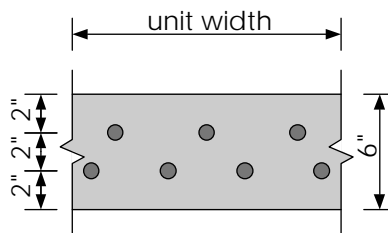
Cross Section of Longitudinal Reinforcement in the Deck
